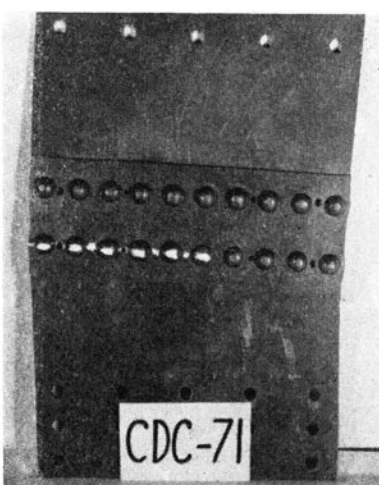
FAILURE BY SHEET TENSION; DOUBLE-STRAP BUTT JOINT WITH SINGLE ROW OF RIVETS ON EACH SIDE OF JOINT, SPECIMEN CDC-71
